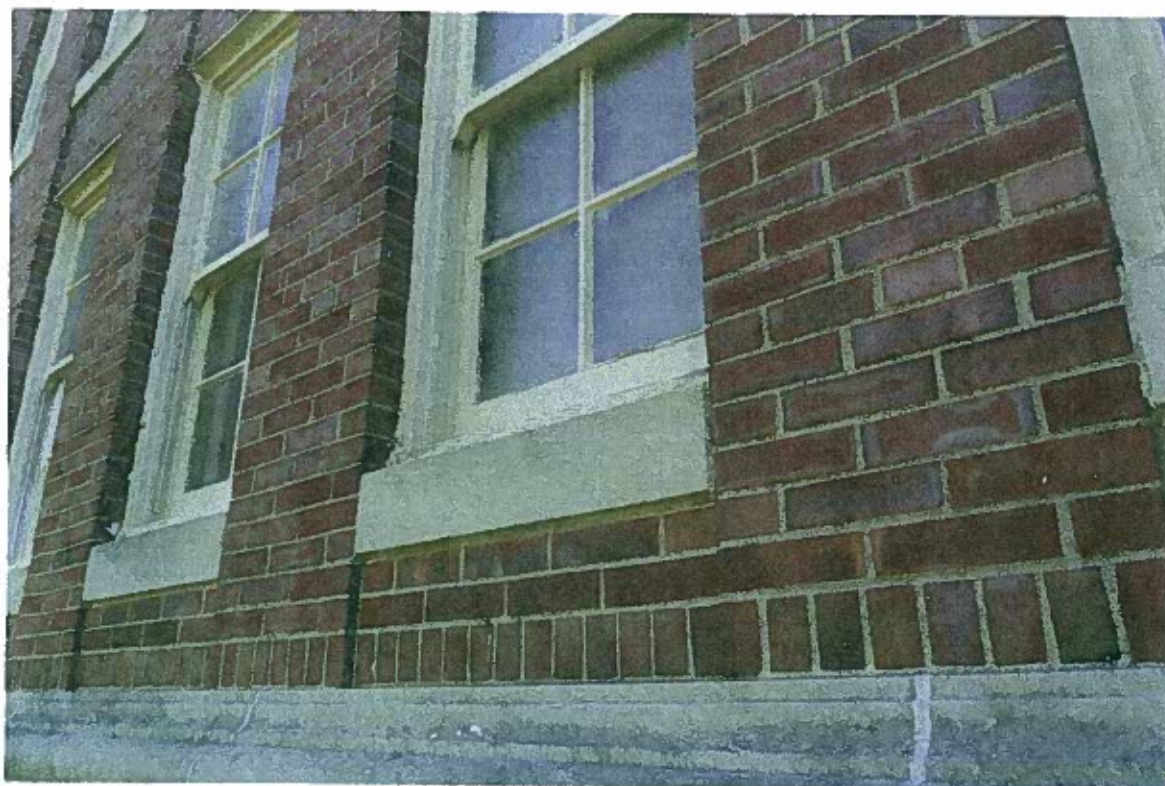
Peeling paint at original wood windows. Windows to be stripped, primed, and painted.
